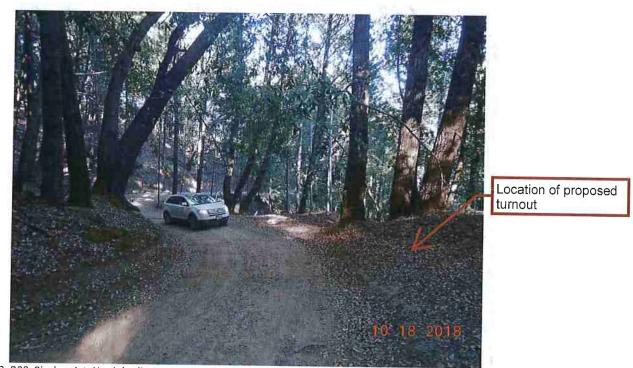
RP8. Pinch point. No sight distance restriction. No turn out provided. Facing north. Install turnout south of RP8.
